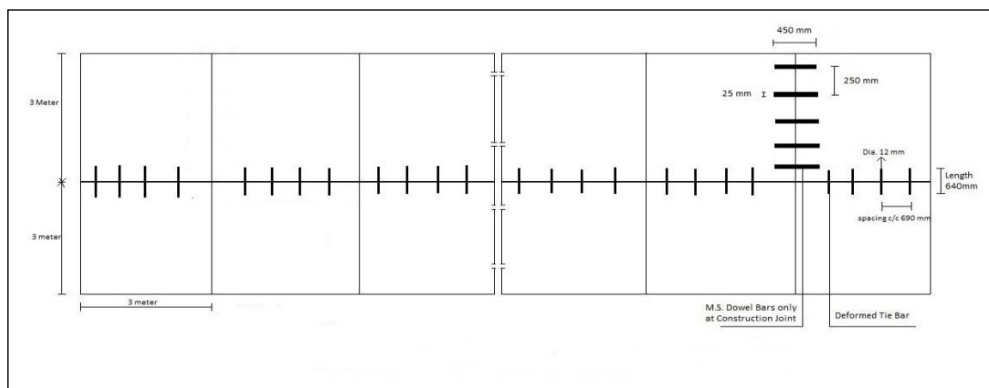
Plan of 3 m x 6 m conventional concrete pavement
